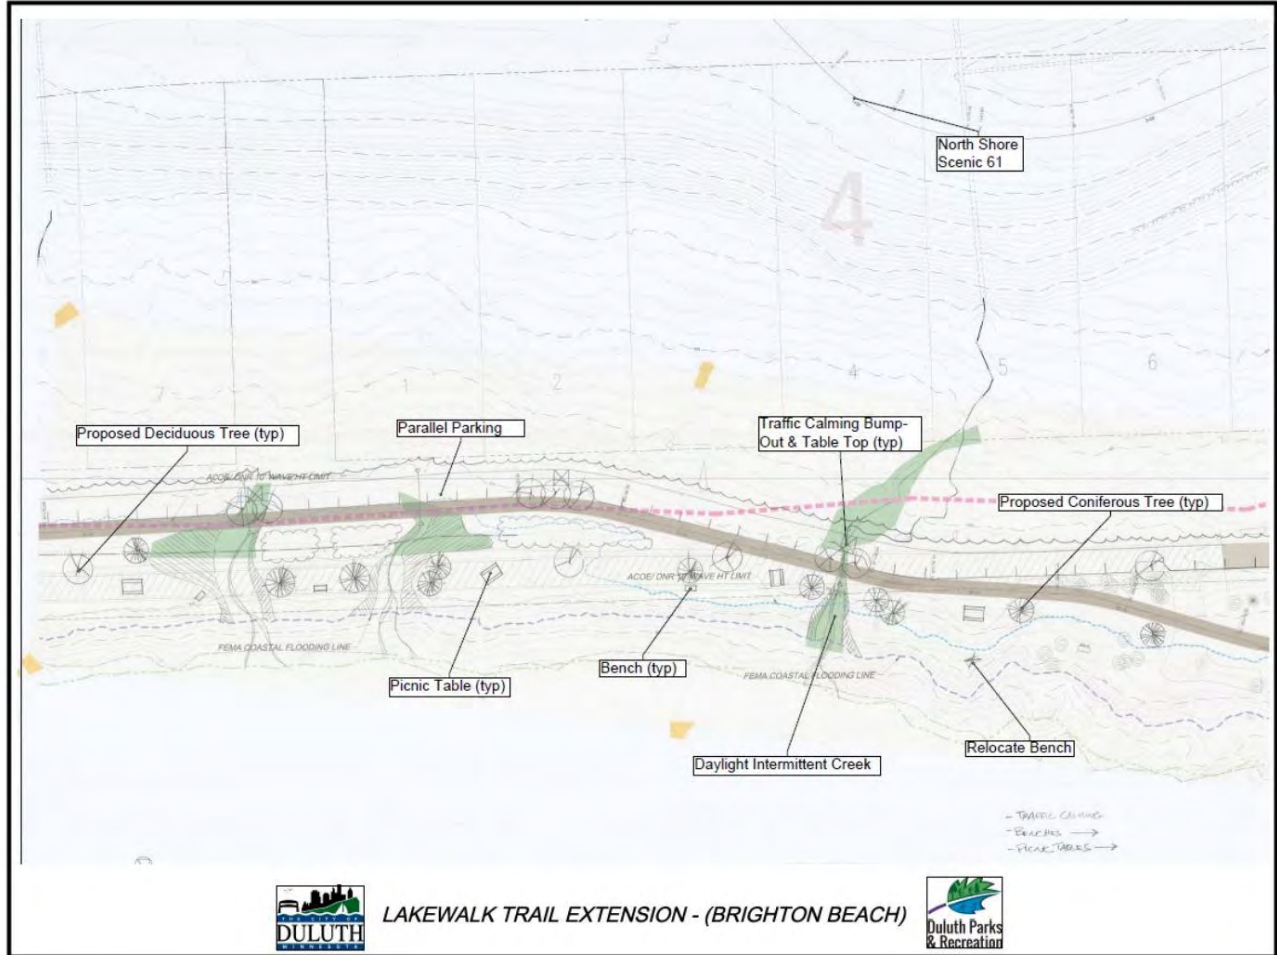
Preliminary proposed landscape and amenity plan, view of Kitchi Gammi Park and Brighton Beach, with new toilet house, parking, turnaround area, and other amenities.
